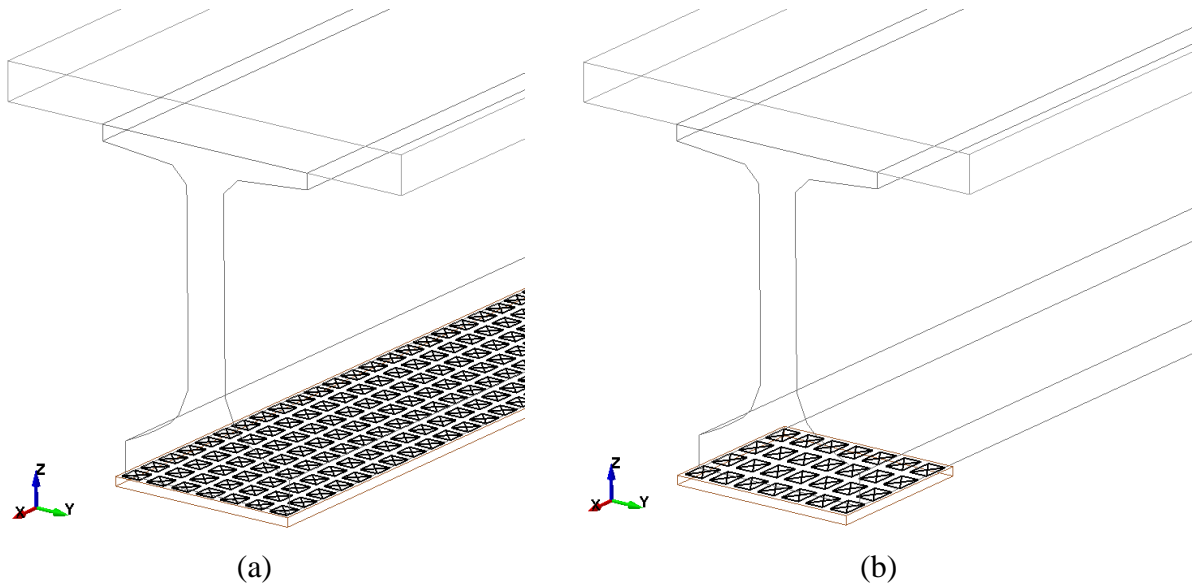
Contact surface definition between girder and (a) steel bed and (b) bearing plates
